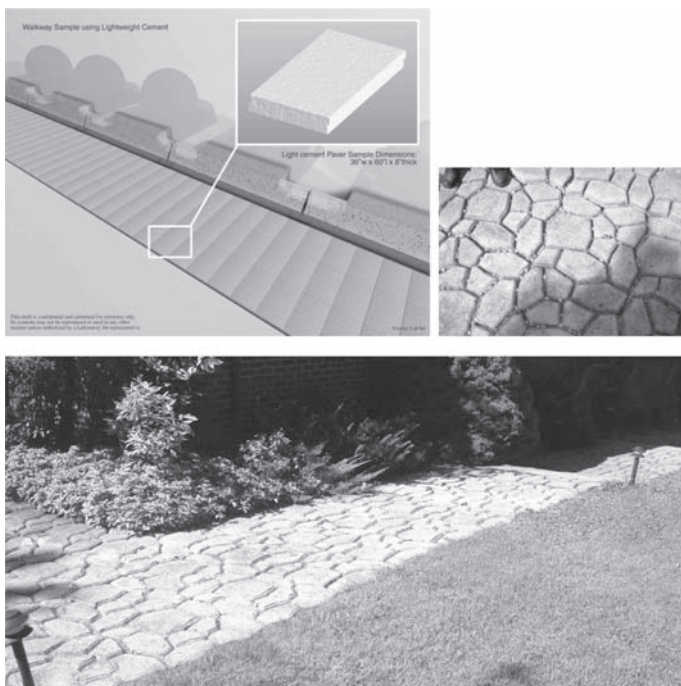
Caption of proposed bridge walkway section illustration and photos of sample walkway made of Lightweight material pavers.
